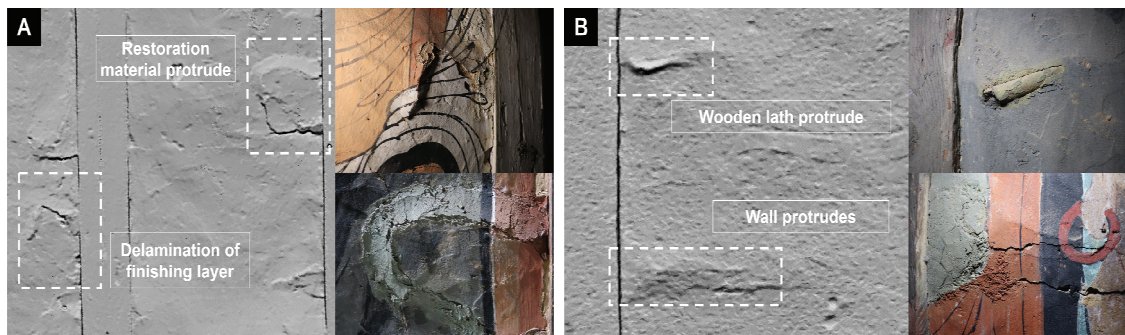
Detection of wall protruded to 3D scanning (A: Avalokitesvara Bodhisattva mural, B: Buddhist Monk Bodhidharma mural).
